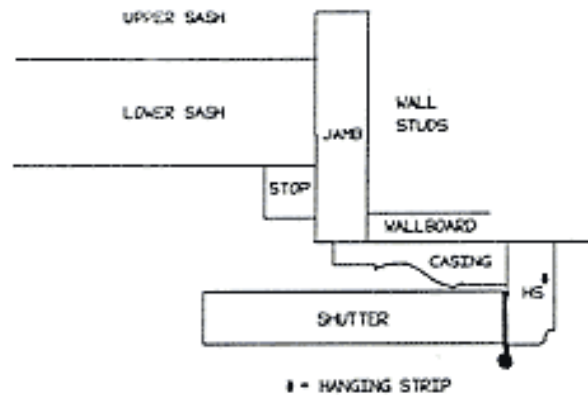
OUTSIDE MOUNT ON SIDE OF CASING USING HANGING STRIP
